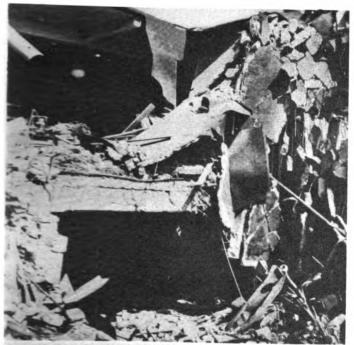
Captured photo snowing fire and blast damage to building 42.
